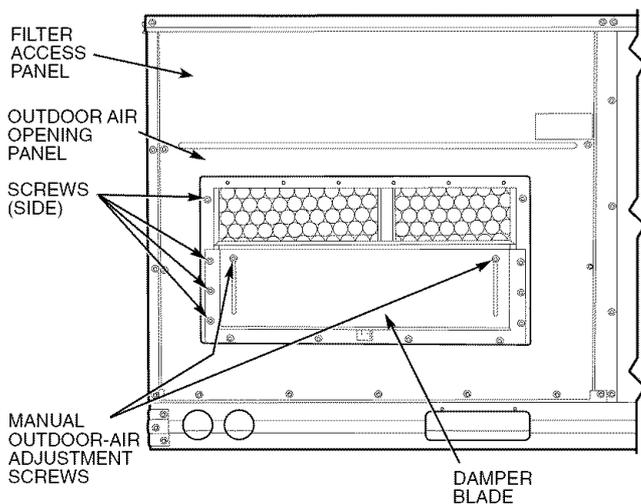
Damper Panel with Manual Outdoor-Air Damper Installed
